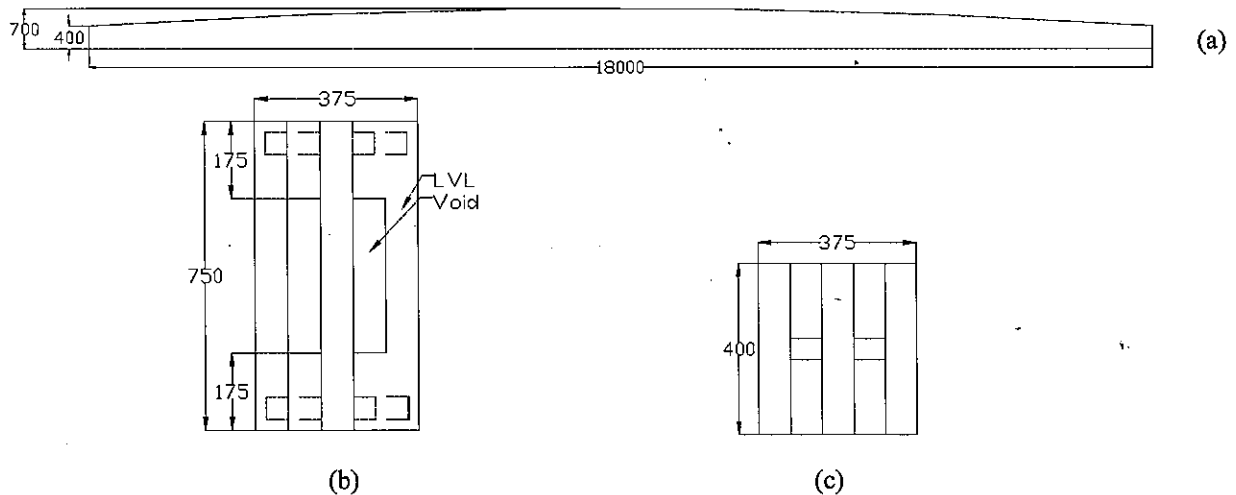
Long span road-over-rail beam (a) Elevation (b) Mid-span Section (c) End of Beam
